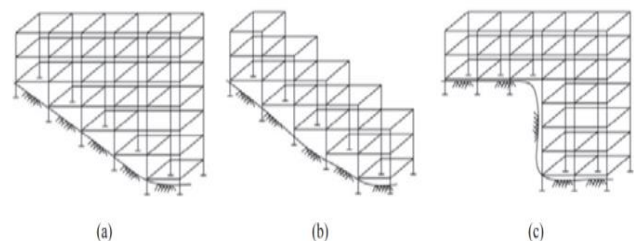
Configuration of buildings build on hill slopes: (a) Set-back building, (b) Step-back building, (c) Set-back Step-back building. [4]
